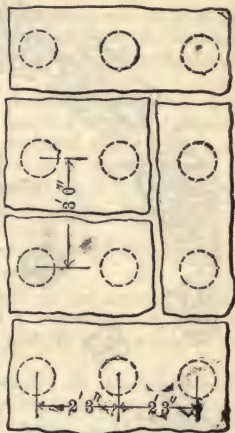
Stone Capping for Three Rows of Wooden Piles
